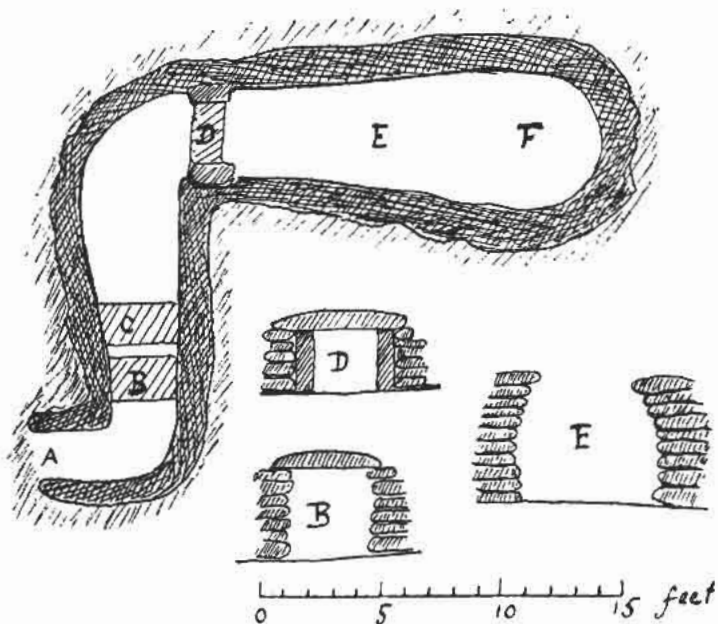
Ground-plan and sections of earth-house near Broomhouse, Berwickshire.
